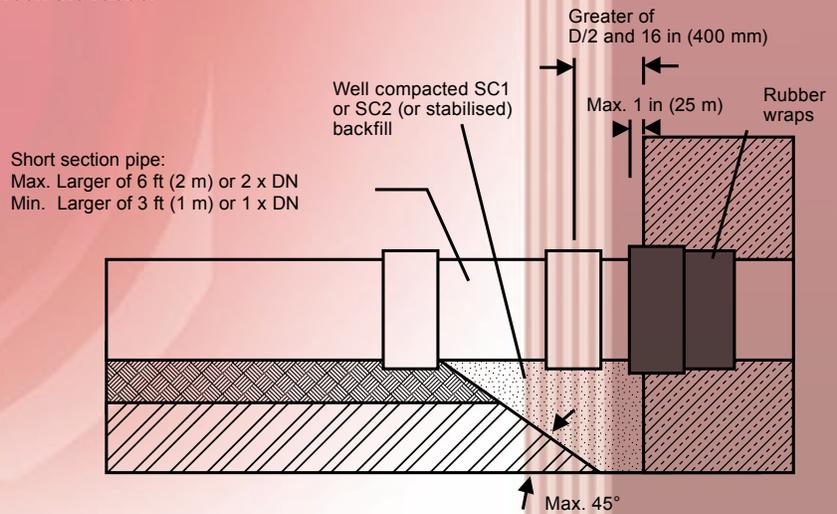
Alternate connection – Rubber wrap encased in concrete
